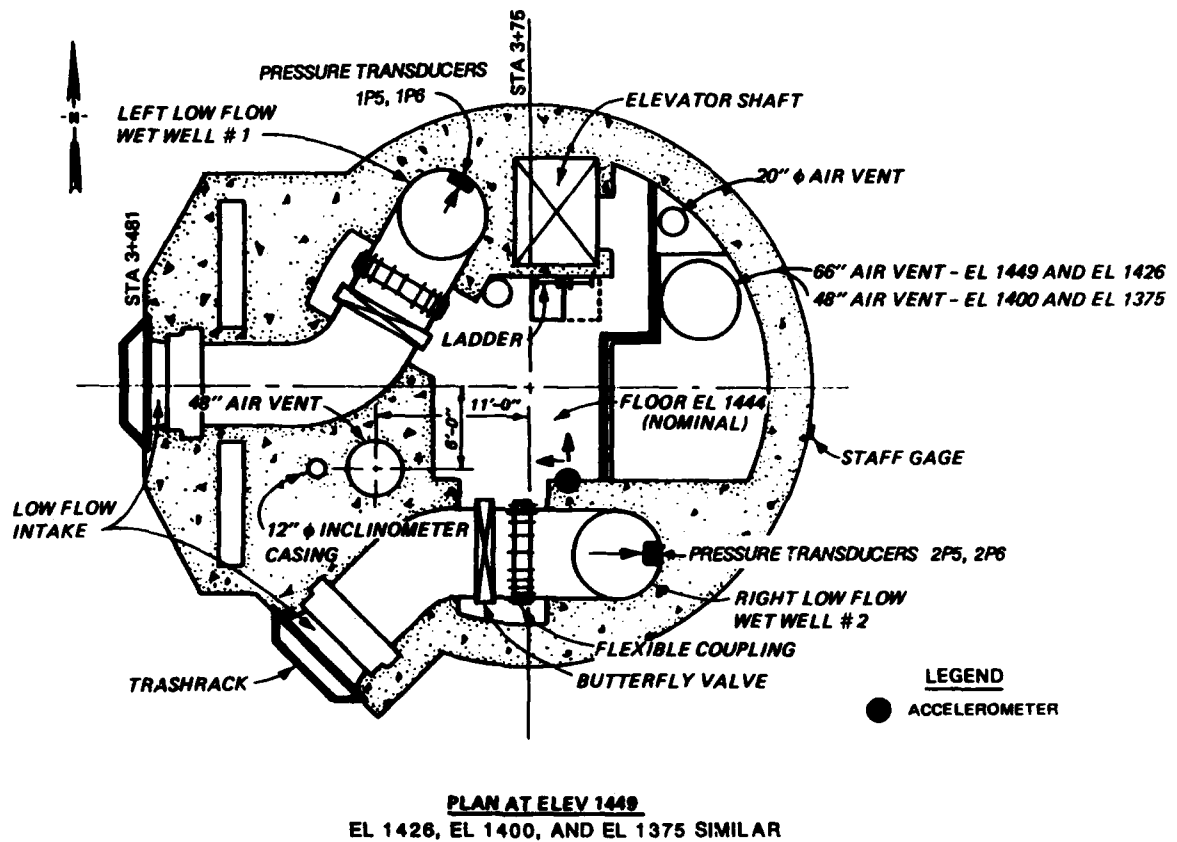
Typical accelerometer locations below elevation 1,525.0 ft
